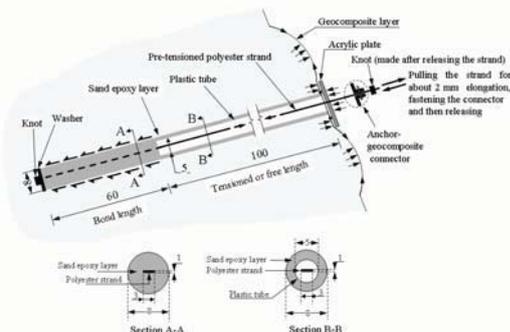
Schematic diagram showing details of anchors of AGS (all dimensions are in mm)
